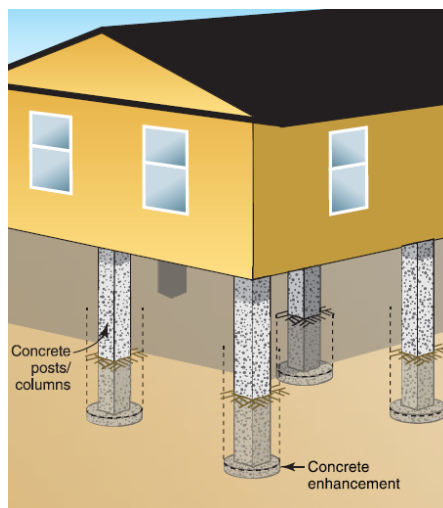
Concrete posts installed beneath an elevated structure (FEMA).
